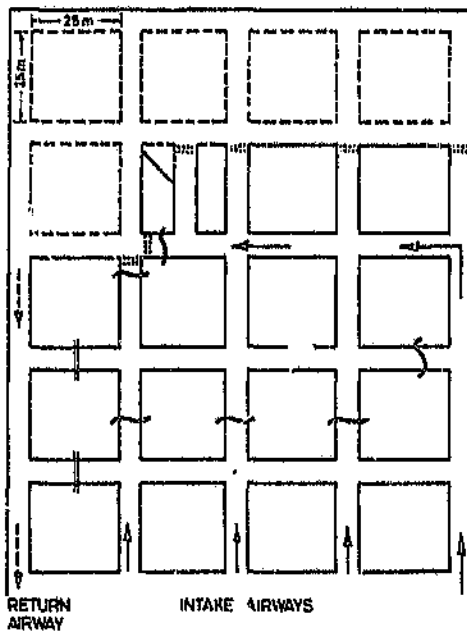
Typical Ventilation Layout when Extracting Pillars in a Straight Line
